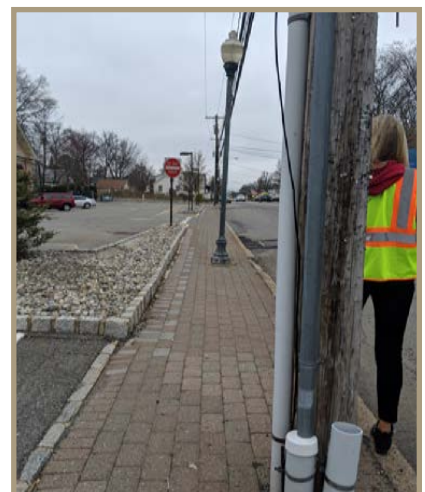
Narrow sidewalk across from the Foodtown shopping center, looking northward on North Beverwyck Road.
